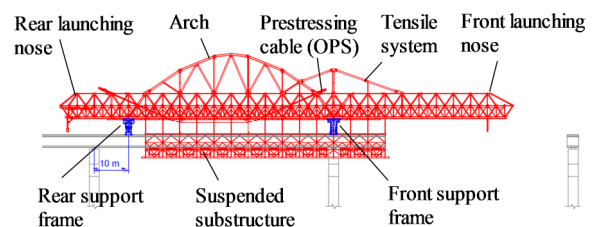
Elevation of the MSS main girder including suspended substructure for support of the formwork panels [28].
